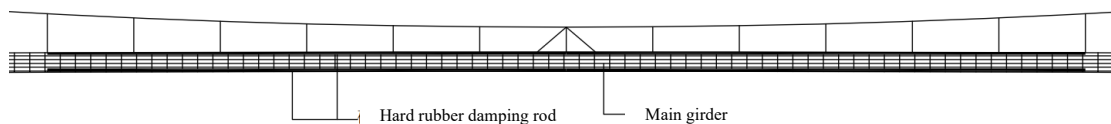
Longitudinal damping cables between main cable and main girder
